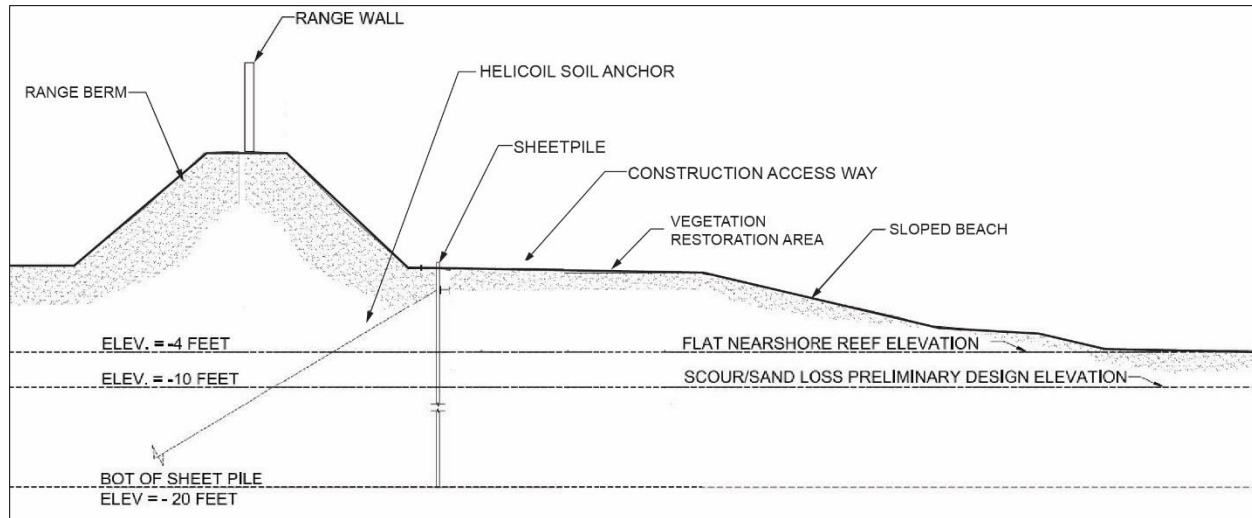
Sheet Pile Construction Conceptual Cross Section
